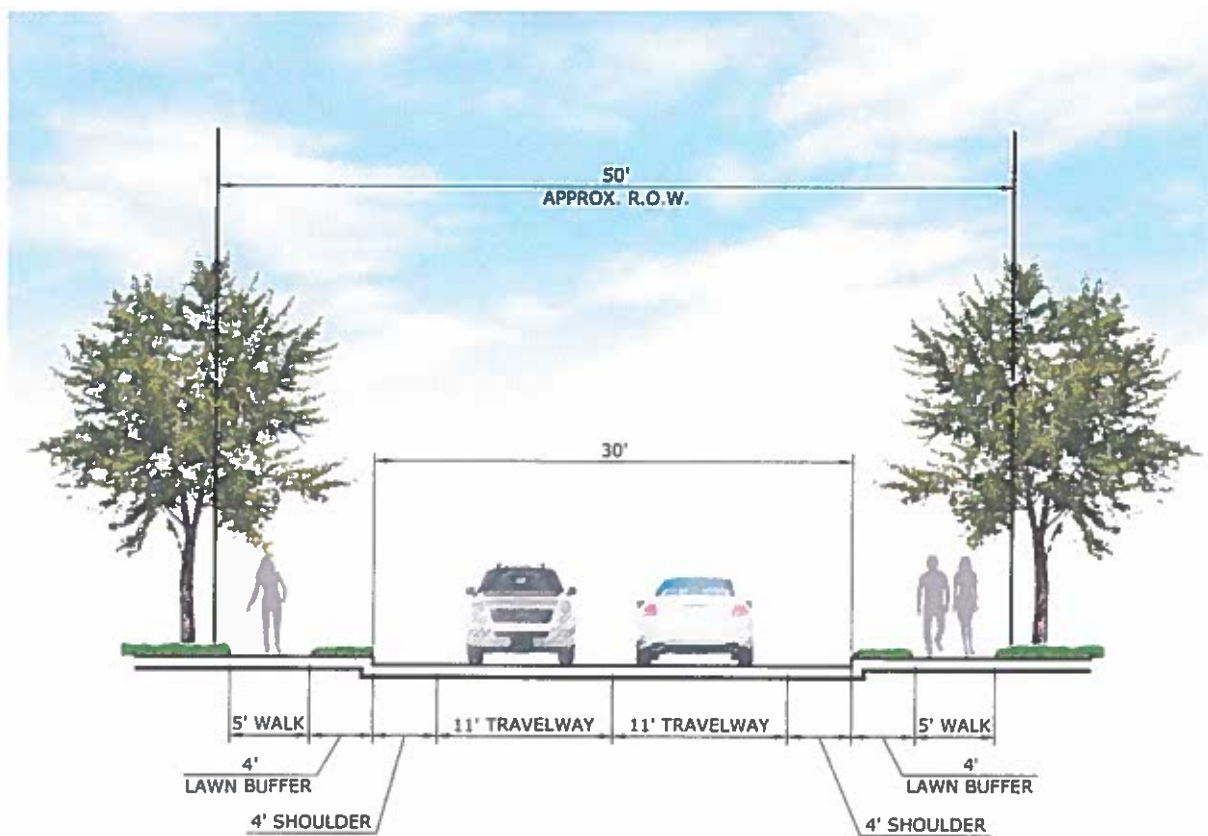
Recommended cross-section on Route 341 east of the Village Center
